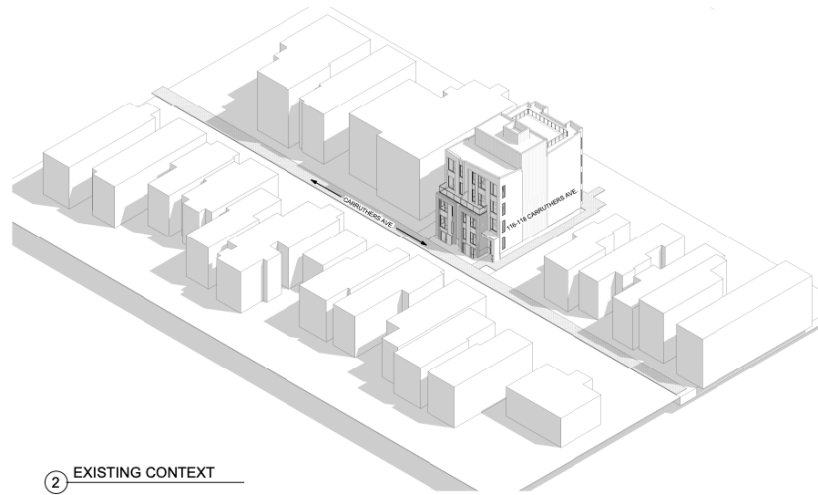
3D renderings of proposed development showing surrounding existing planned context (Source: Redline Architecture)
